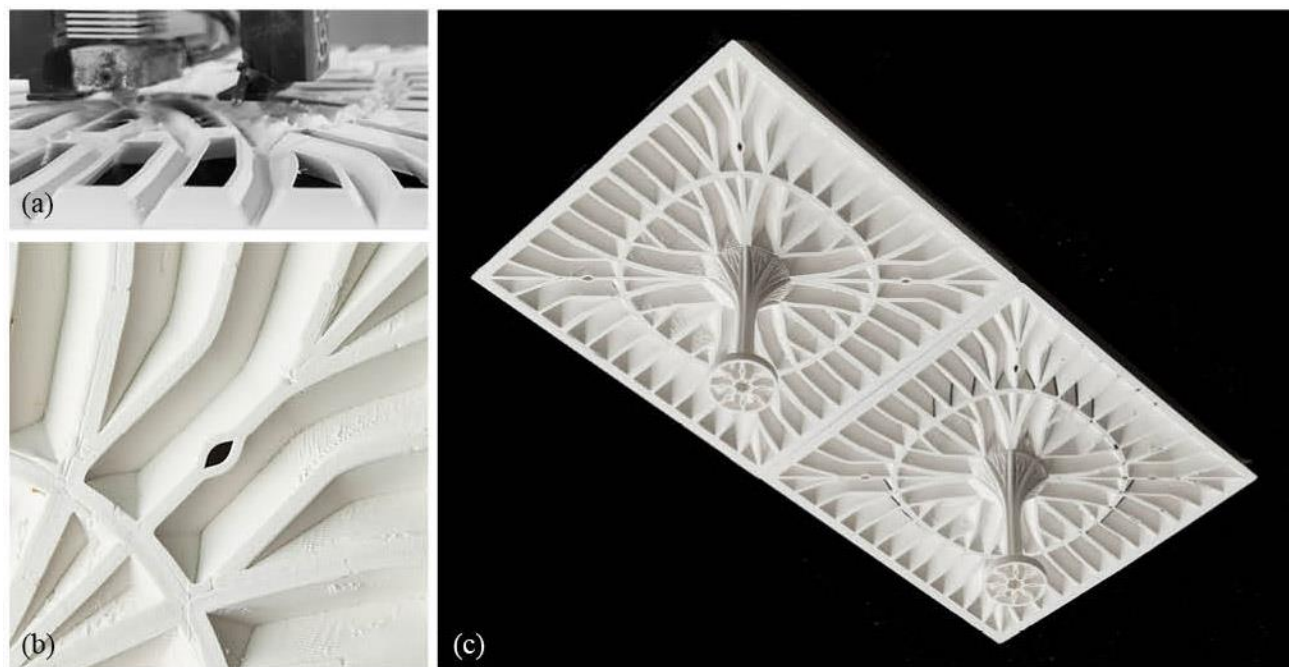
FDM printing ribbed slab (a) Printing process (b) Bottom view of the soffit (c) Bottom perspective of the lamella column-slab system
